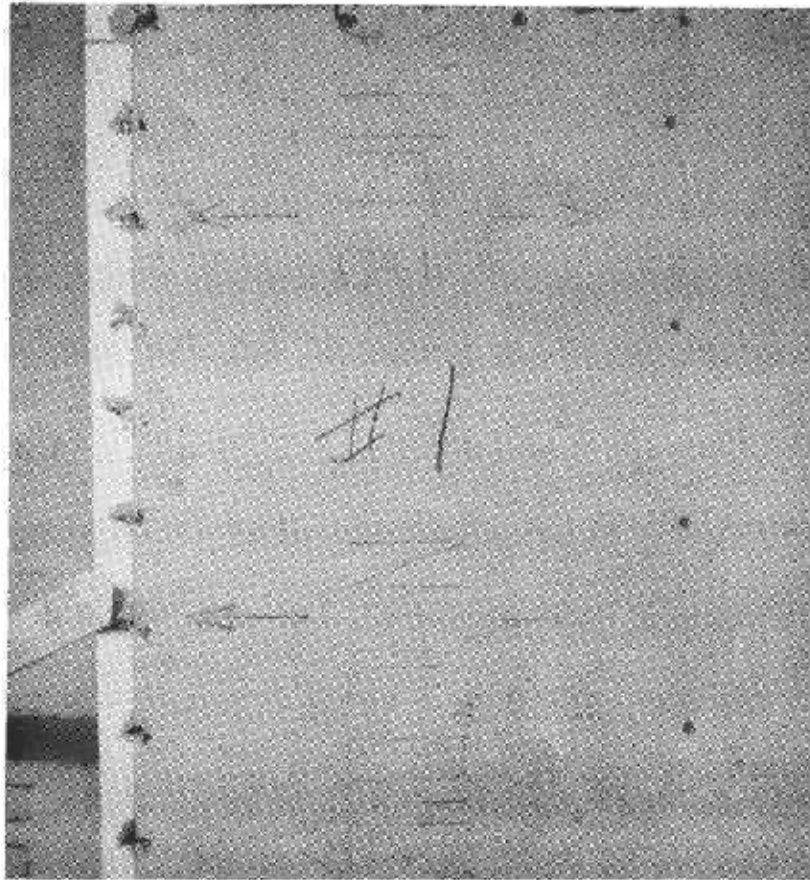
Fiberboards torn from nails -- typical failure during racking test of panels without openings and panels with openings when fiberboard was applied in full-length sheets.
